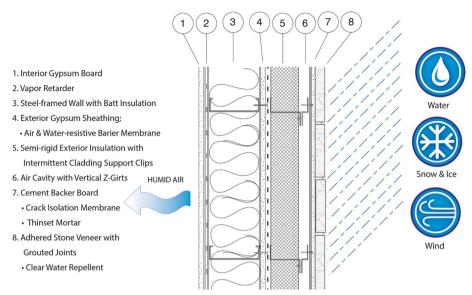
Typical steel-framed rainscreen wall section with stone veneer cladding. Integrity of wall can be compromised by rain, snow and ice, and wind causing failure of cladding and moisture barrier systems and introducing humid air into interior rooms. Moisture and humidity control are critical for conservation of art objects. (Source: the authors)
